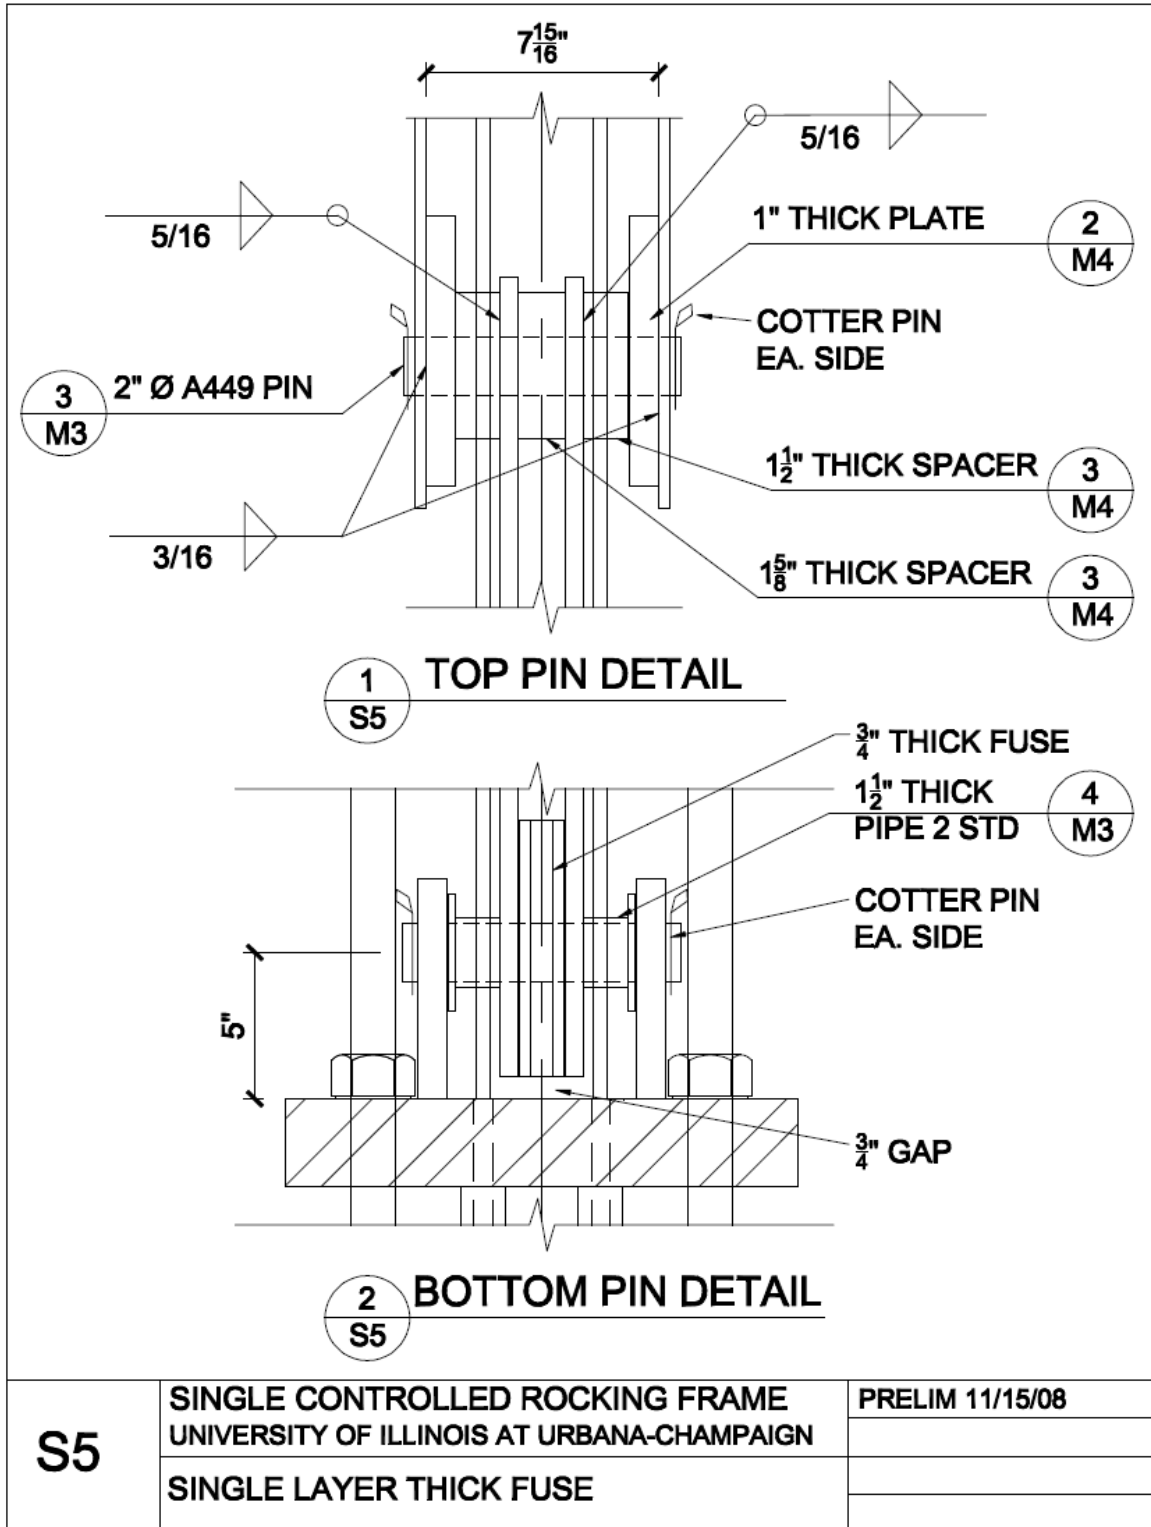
Design Drawing for the Single Frame Configuration – Specimen B1 Close-Up
